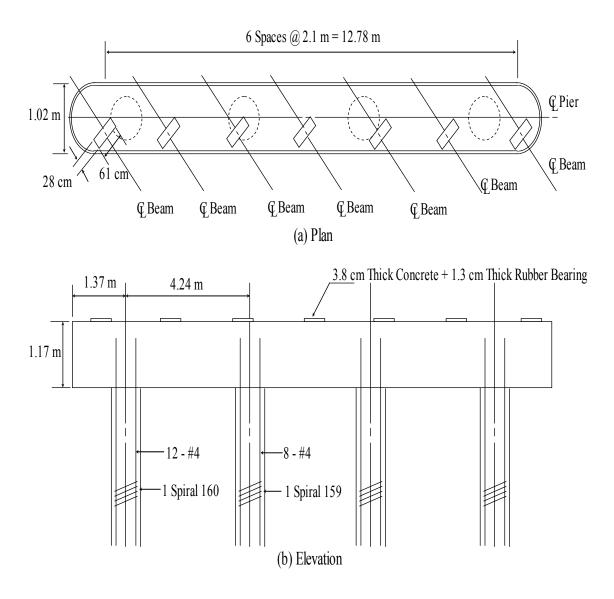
(a) Plan and (b) Elevation Views of Pier Cap and Supporting Columns
